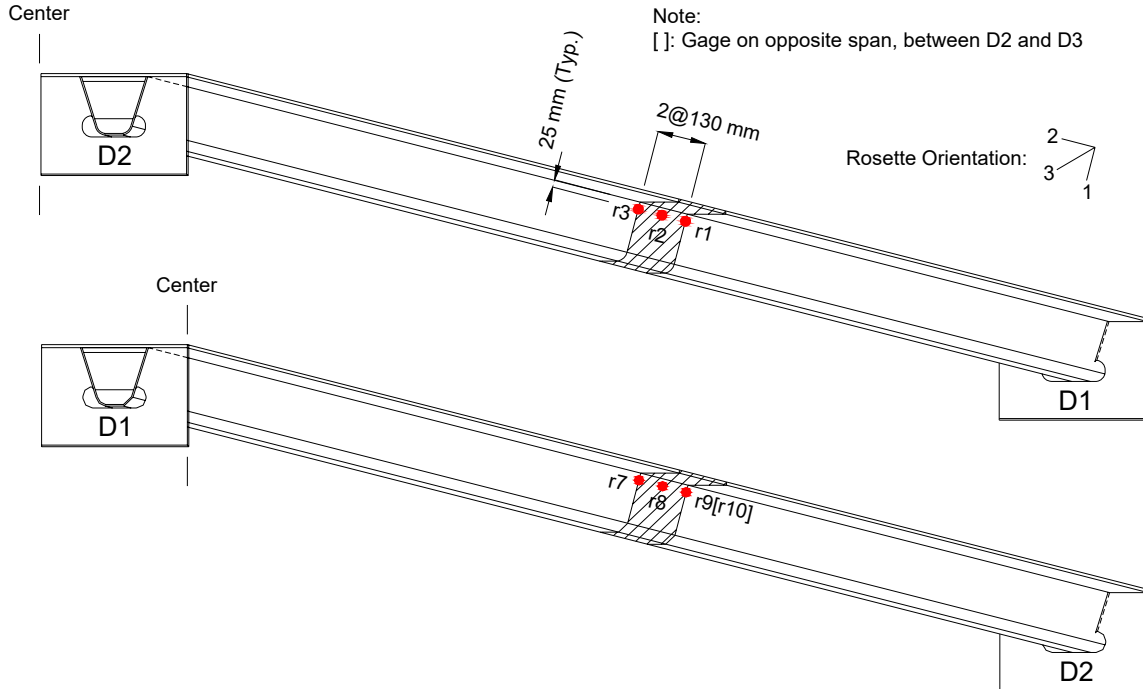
Specimen 6: Strain Gages in Outer Surface of Rib R2 near Rib-to-Deck Welds
